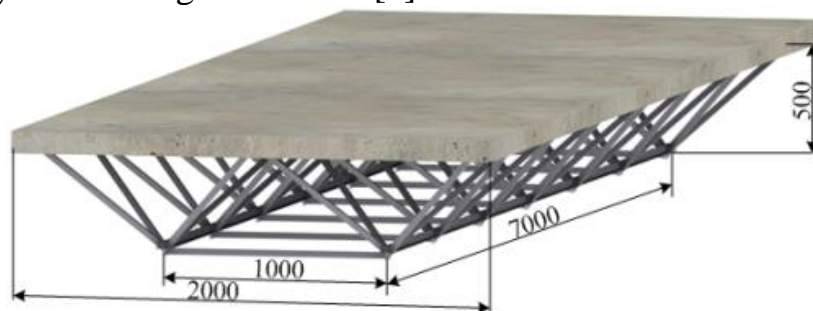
Scheme of the studied design of the pedestrian bridge span structure
